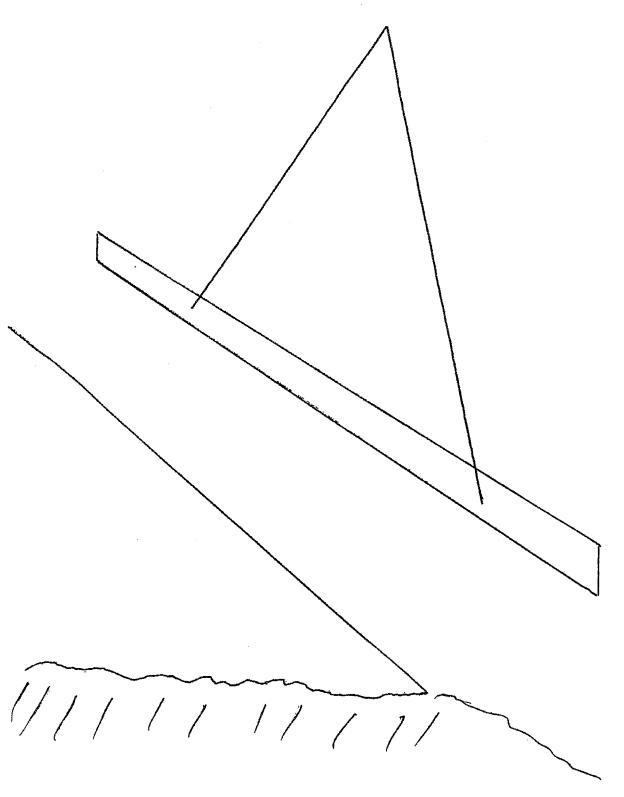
(K-20) West Wailuanui #9 intake- Ko'olau Ditch
